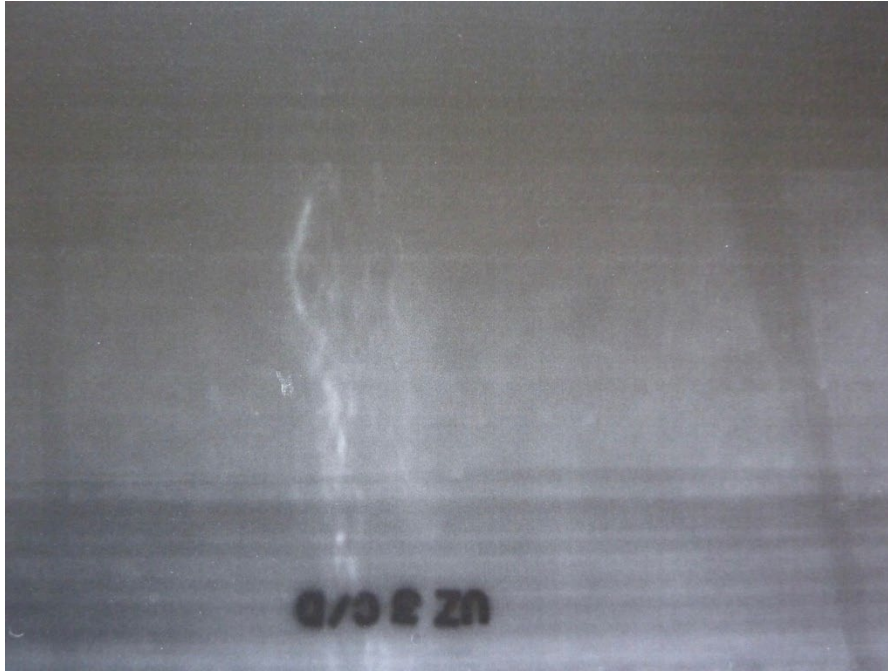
Dark lines on bottom of the chord indicating prestressing and reinforcing steel, vertical dark line caused by stirrup, bright lines due to cracks in concrete
